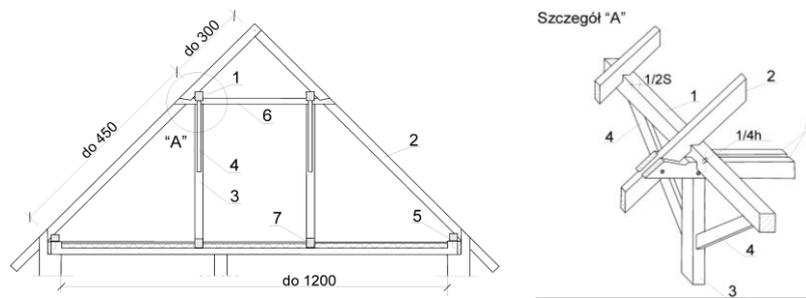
Purlin-tie roof with two intermediate purlins: 1 - purlin, 2 - rafter, 3 - post, 4 - angle brace, 5 - plate, 6 - collar tie, 7 - ground sill
